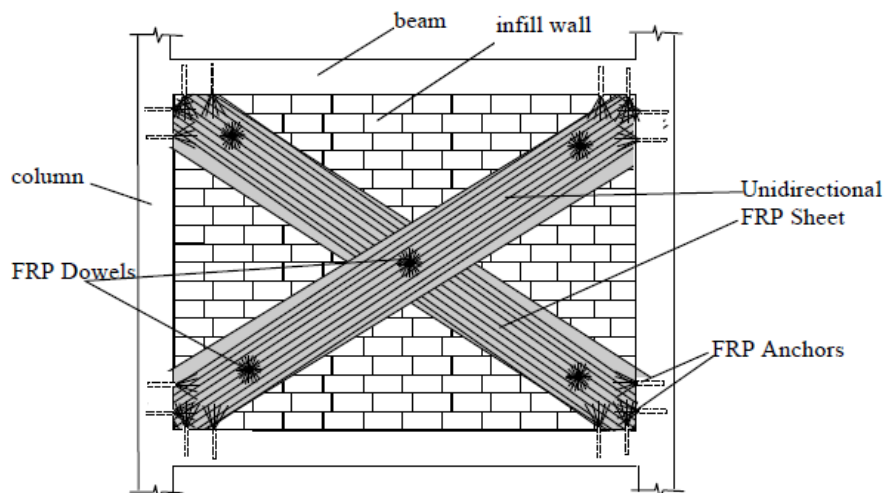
FRP strengthening method for reinforced concrete frames with infill walls [38]
